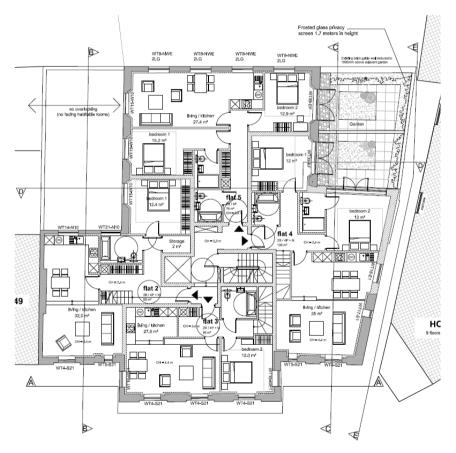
Proposed first floor plan illustrating the residential units and amenity spaces.
